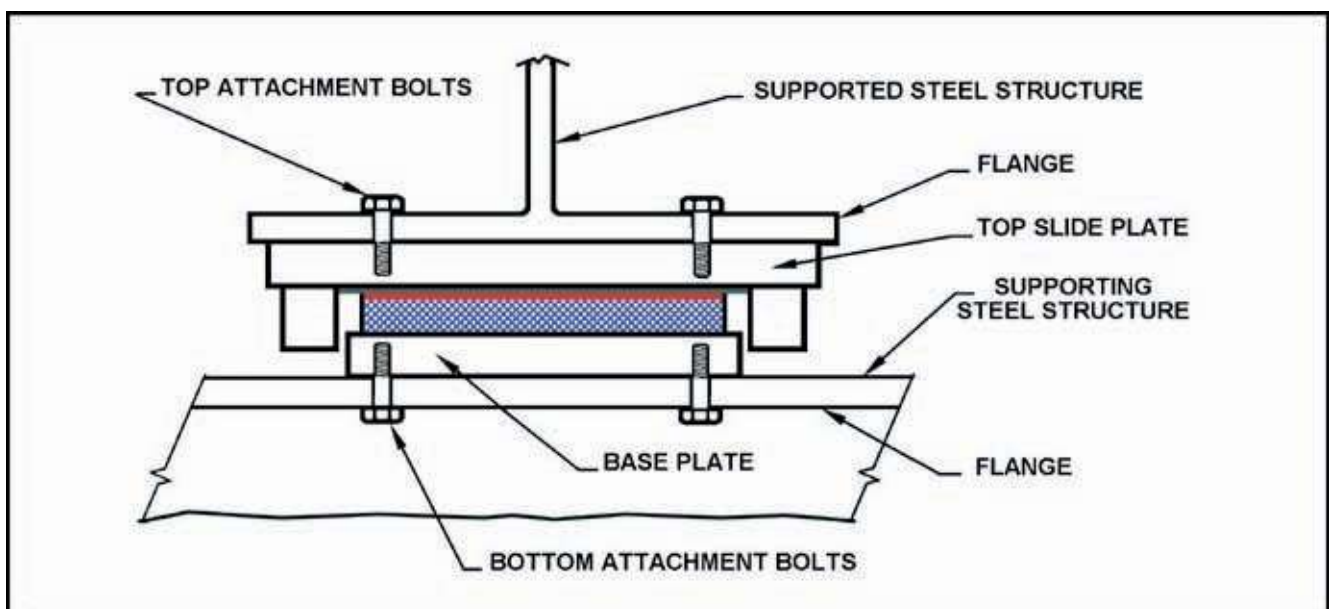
Installation of a HLD/SG Bearing in a Steel Structure
